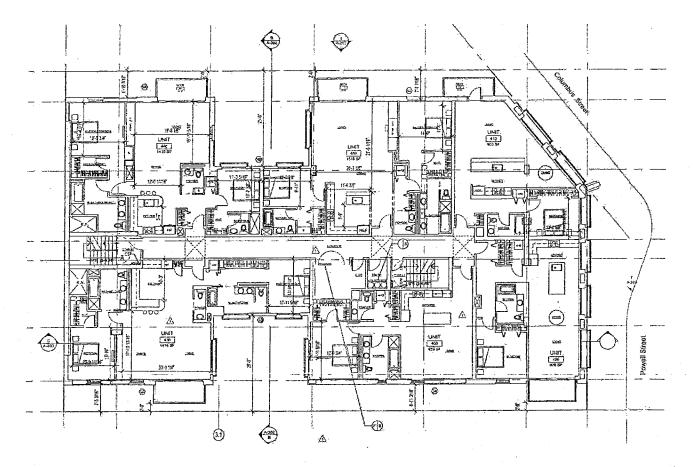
PROPOSED 1731 POWELL ST FOURTH LEVEL PLAN Source: SWS 1/7/13
